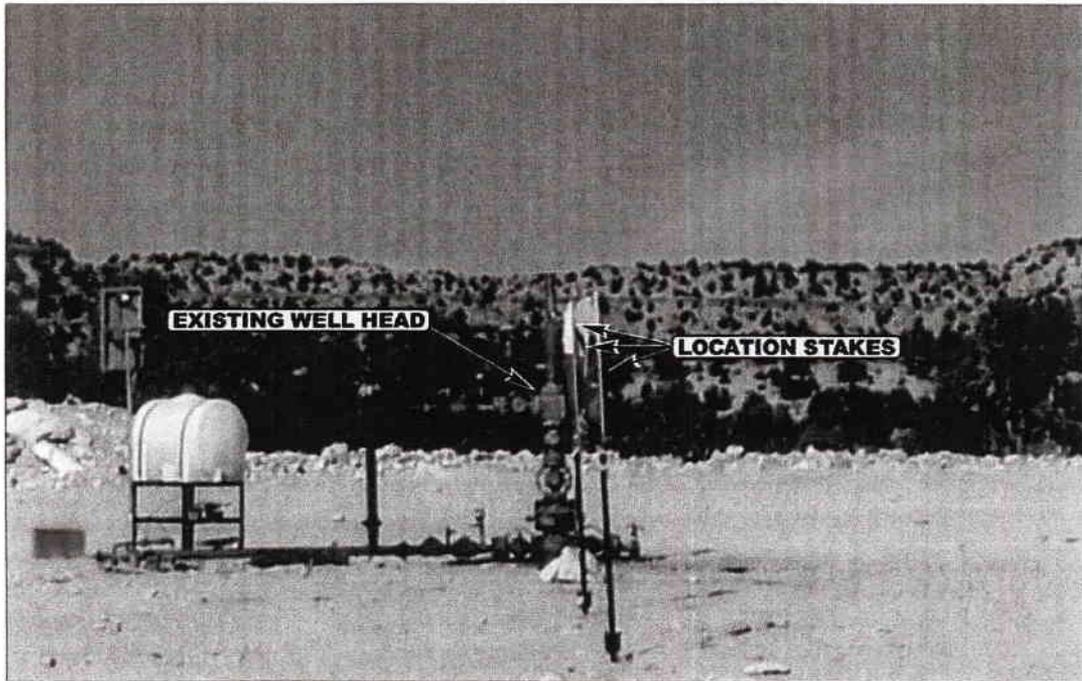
PHOTO: VIEW OF LOCATION STAKES & EXISTING WELL HEAD
